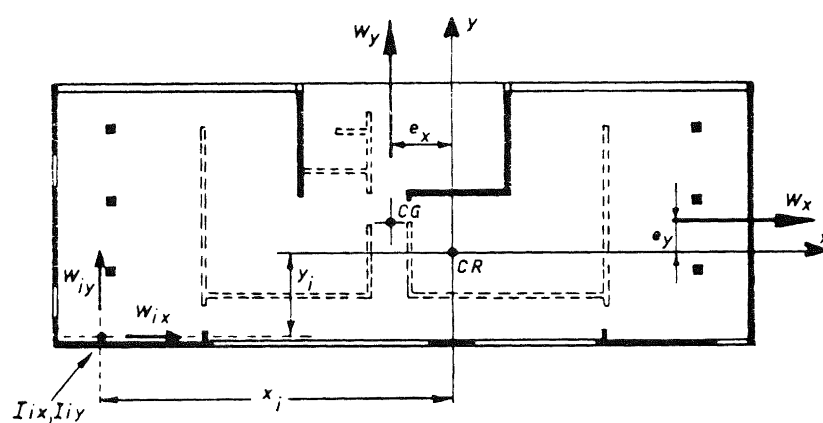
Shear Wall Layout for an Apartment Building (2)
